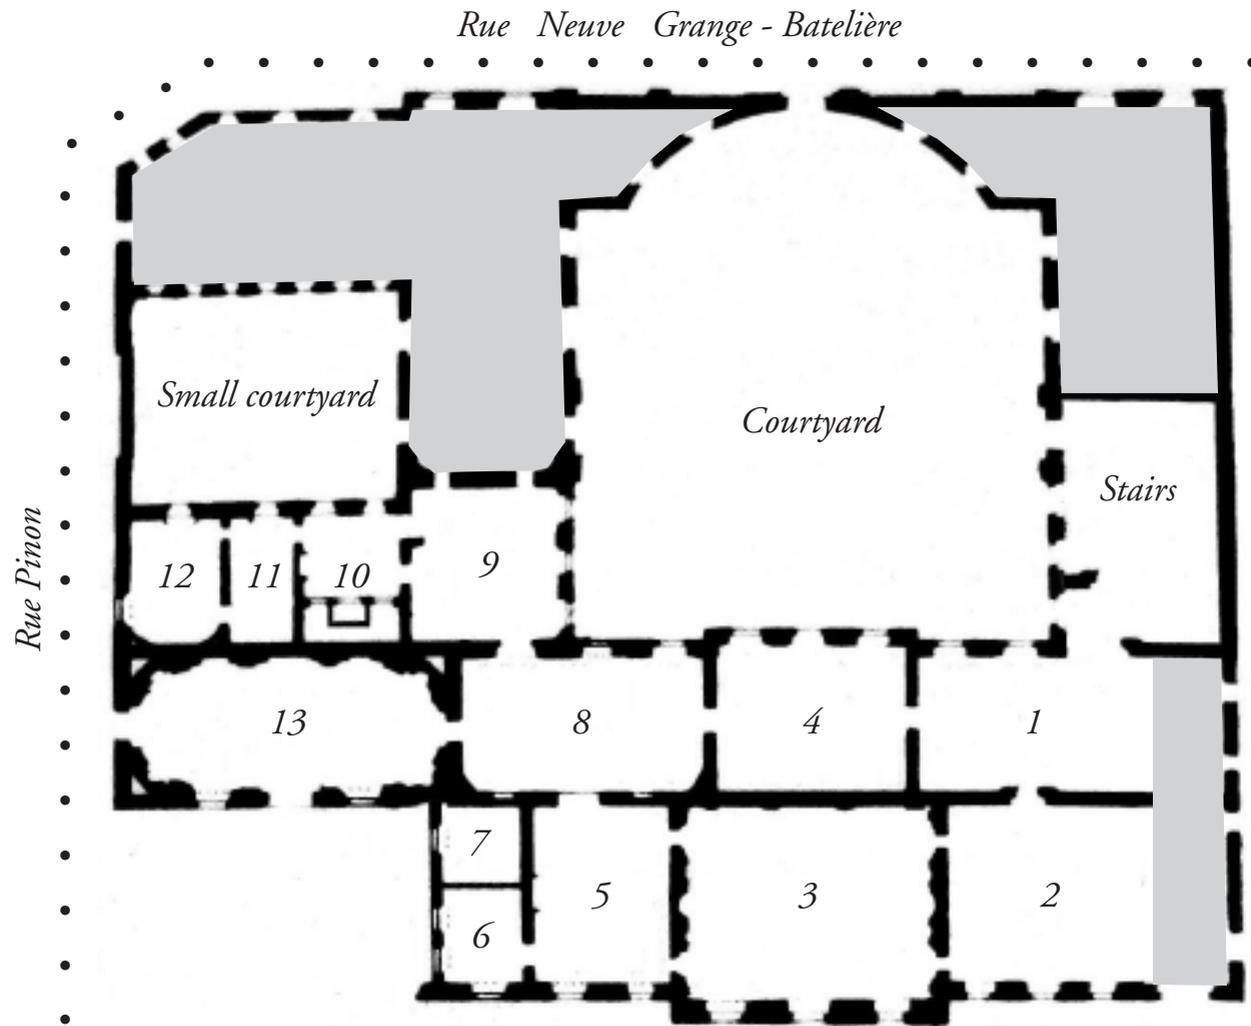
Plan of the first floor of Choiseul's hôtel showing the layout of the principal apartments.
